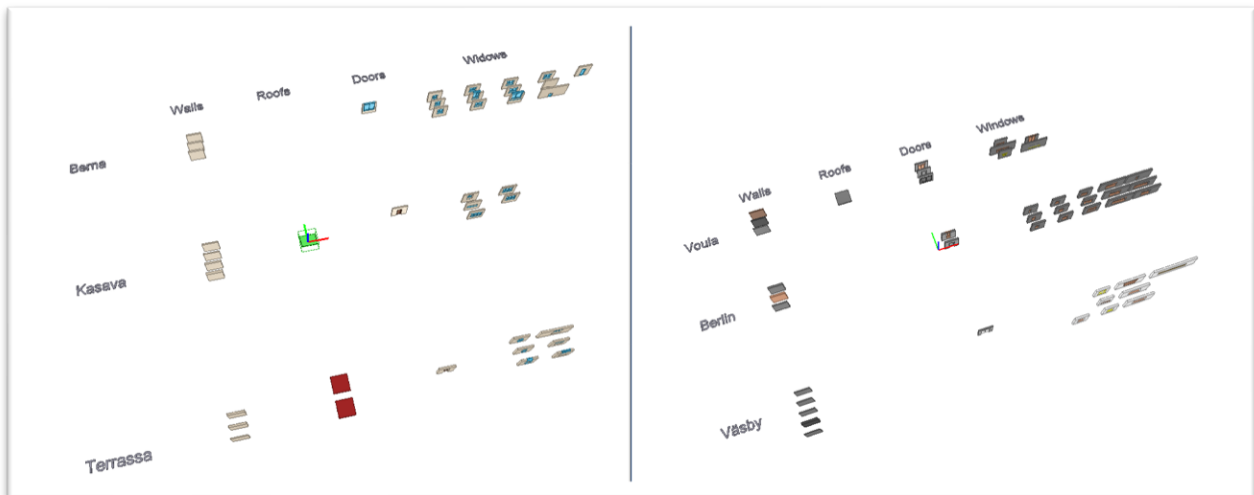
MASTER FILES CONTAINING THE BUILDING ELEMENTS OF THE SIX DEMO SITES BUILDING ENVELOPES.
